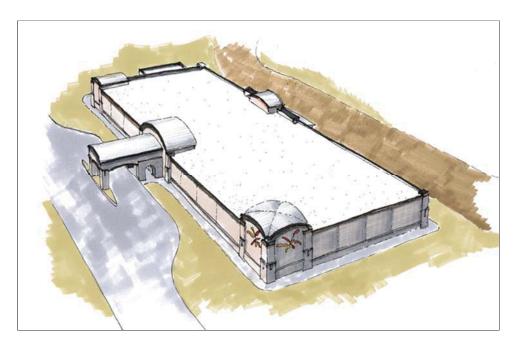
Conceptual Rendering Racetrack and Entertainment Centre
